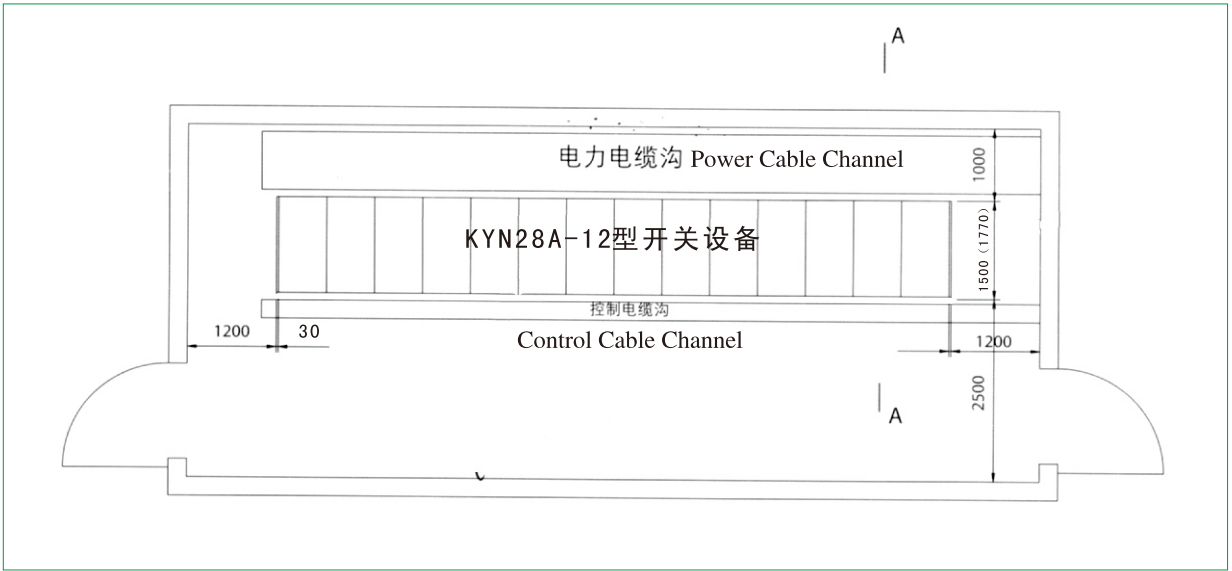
Fig A is the reference scheme for floor plan of power distribution room, it can be for cable channel incoming scheme, for cable bottom outgoing installation scheme, and for cable top outgoing scheme. The Figure just shows the single row arrangement of switchgears, if it is double rows of arrangement, the distance between them shall not be less than 2500mm.
